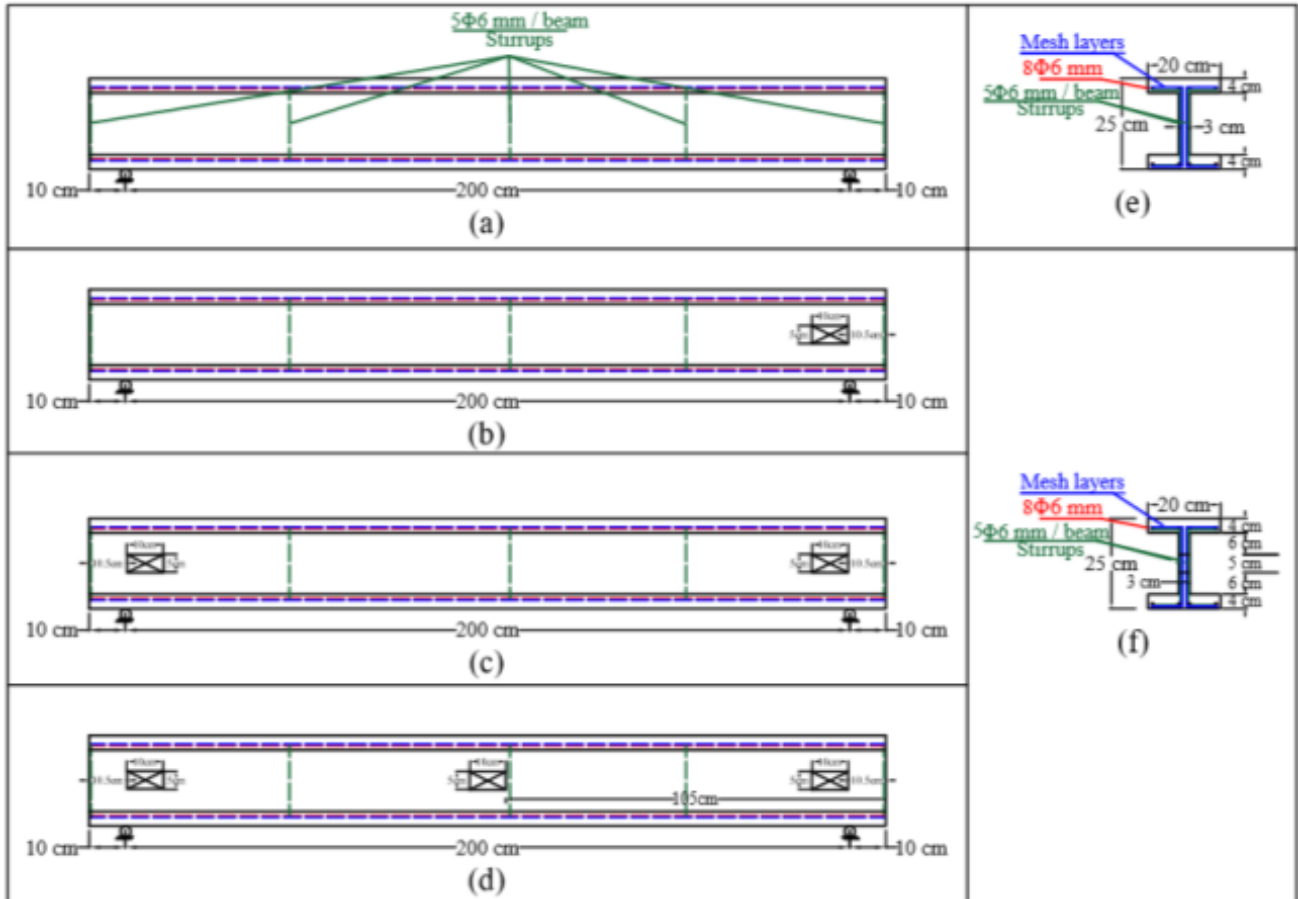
Geometric specifications of examined beams and openings: (a) Control beam; (b) Beams with one opening; (c) Beams with two openings; (d) Beams with three openings; (e) Side view of control beam; (f) Side view of beams with openings.
